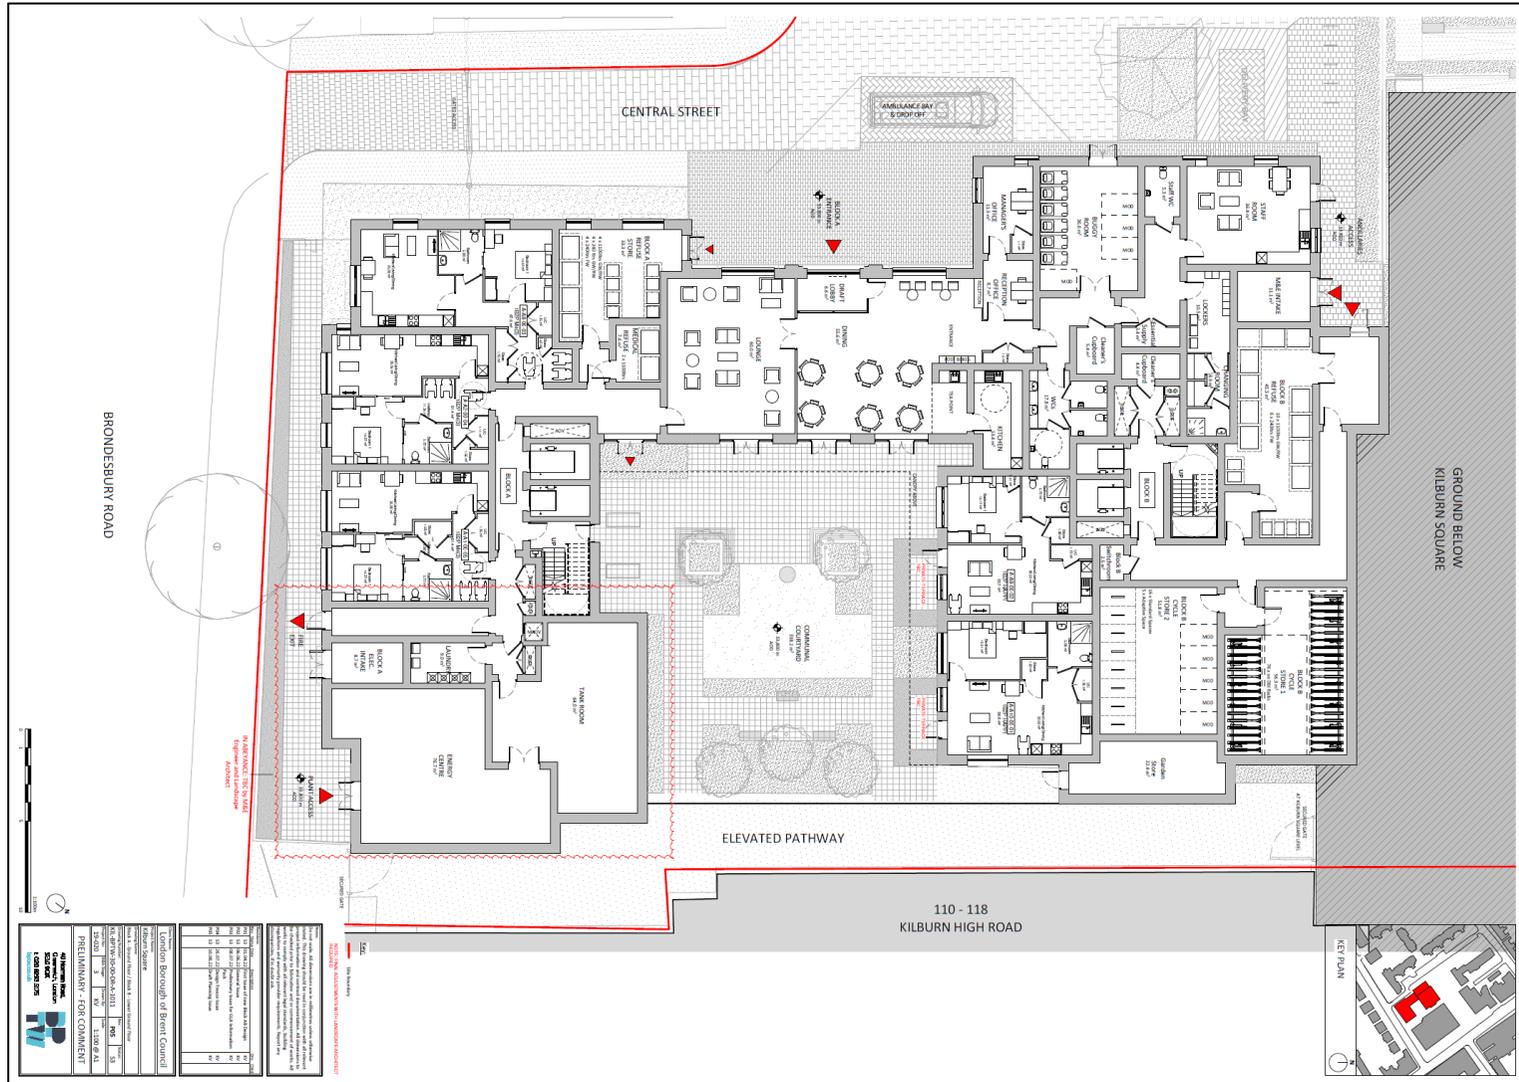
Ground floor/lower ground floor plan of Blocks A & B (Reproduced courtesy of the client).
